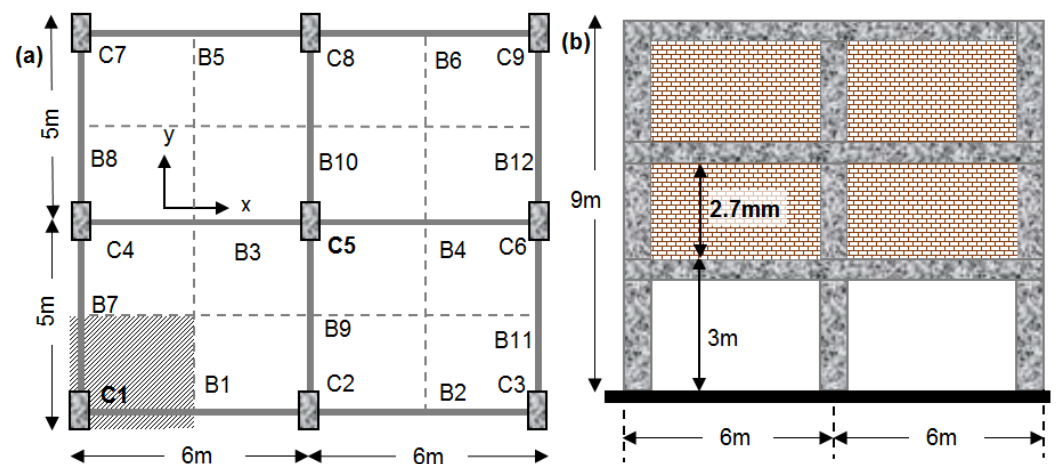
(a) Plan view of a typical storey and (b) elevation view of the building.
